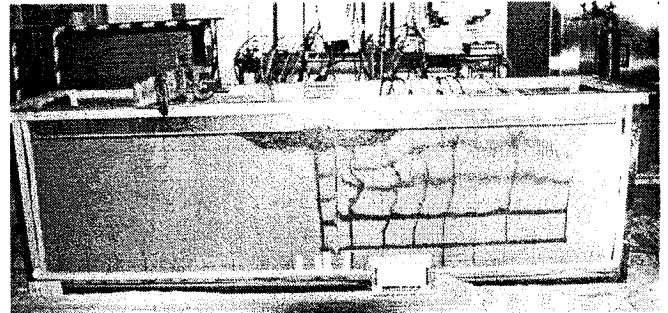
Post-shaking configuration of dike with central installation of sheet piles.
